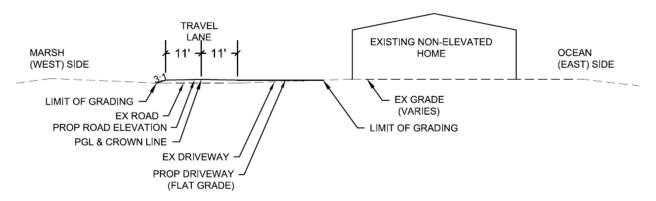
Typical driveway tie-in section "B": non-elevated house on east side of road with proposed flat driveway.
